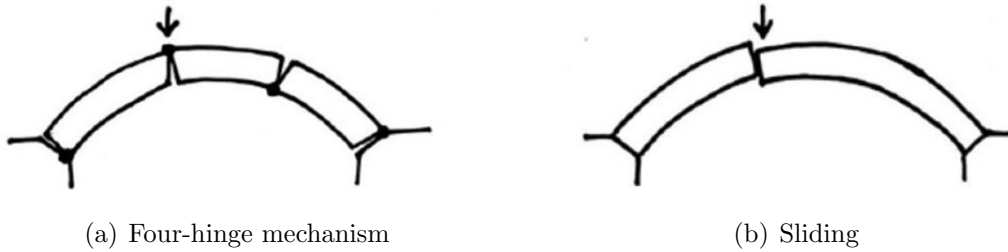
Failure mechanisms of masonry arch: (a) Four - hinge mechanism and (b) sliding; (Melbourne et al., 2007).
